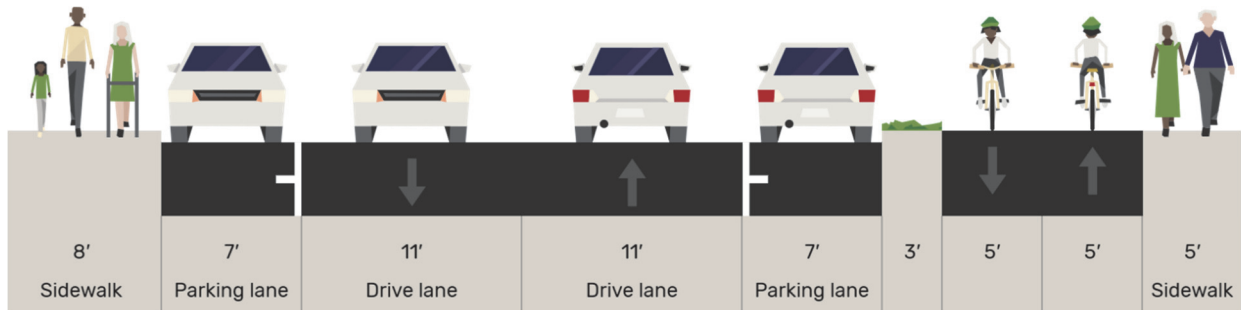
Alternative 2: Parking-Protected Class IV Bikeway (62')
